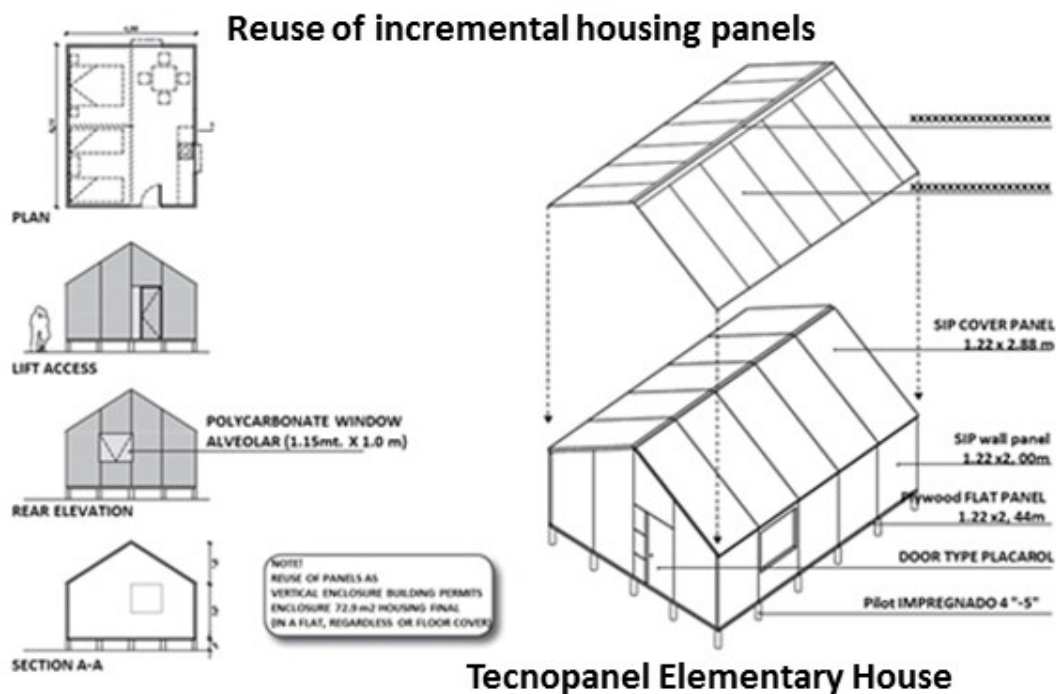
Conceptual design and built prototype of SIP system (http://www.elementalchile.cl/viviendas/casa-elemental-tecnopanel/?lang_pref=en).
